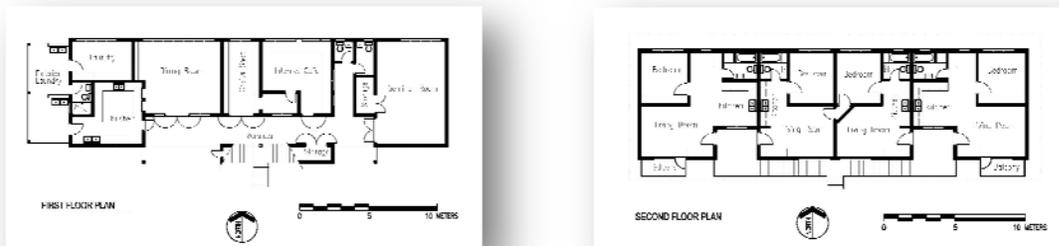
Tanzania: first and second floor plans of Guest House / Conference Center. Source: Fieldwork
